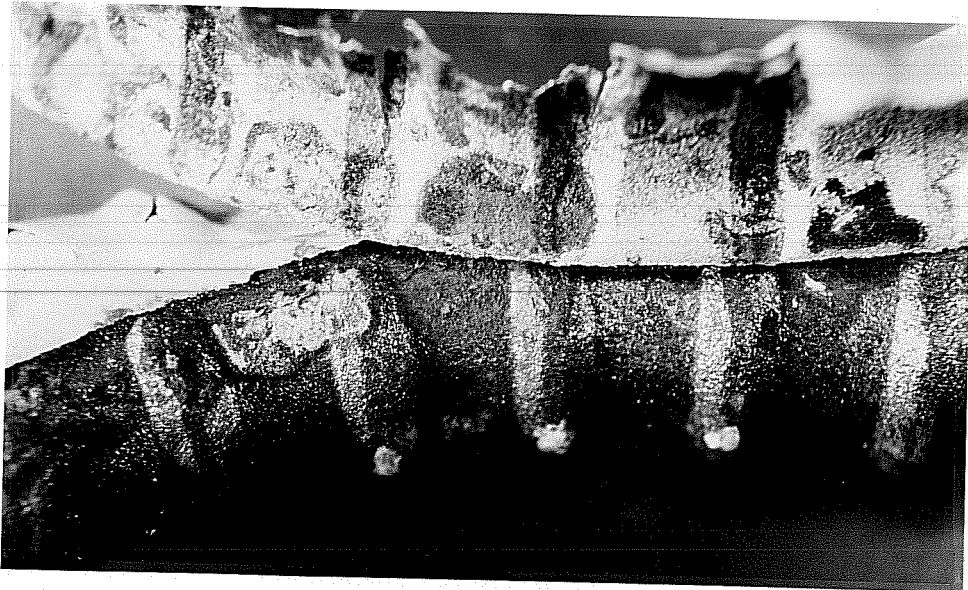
Example of Swelling Spots on bar Surface Outside Concrete Specimen.
